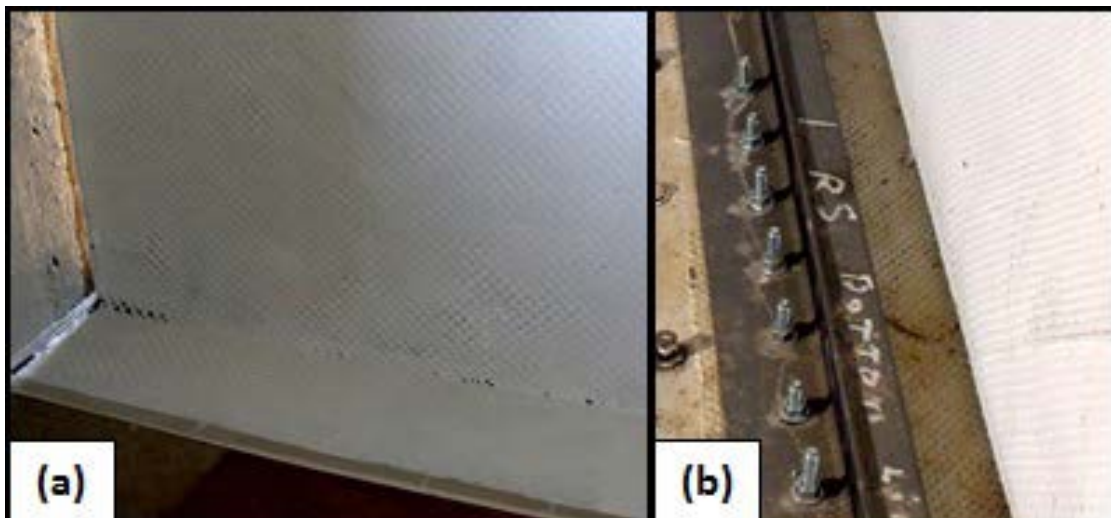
Anchor systems. (a) Bottom support relying solely on adhesive strength. (b) Additional anchorage provided by steel plate.
